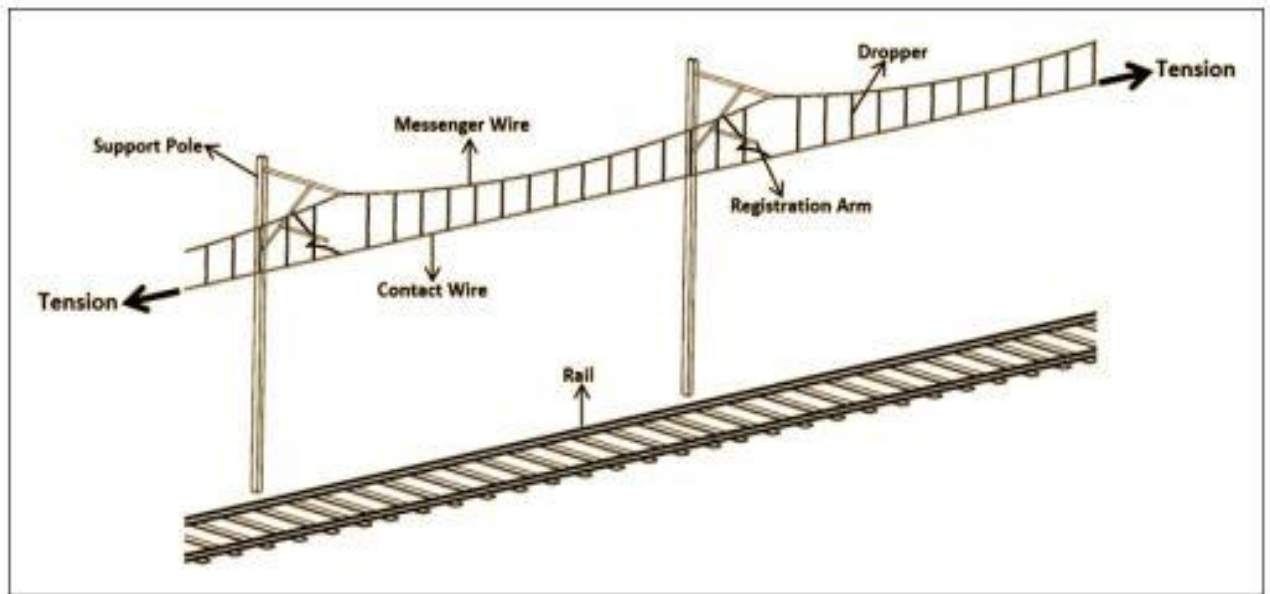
Typical overhead line equipment layout showing simple catenary supported on single track cantilevers
